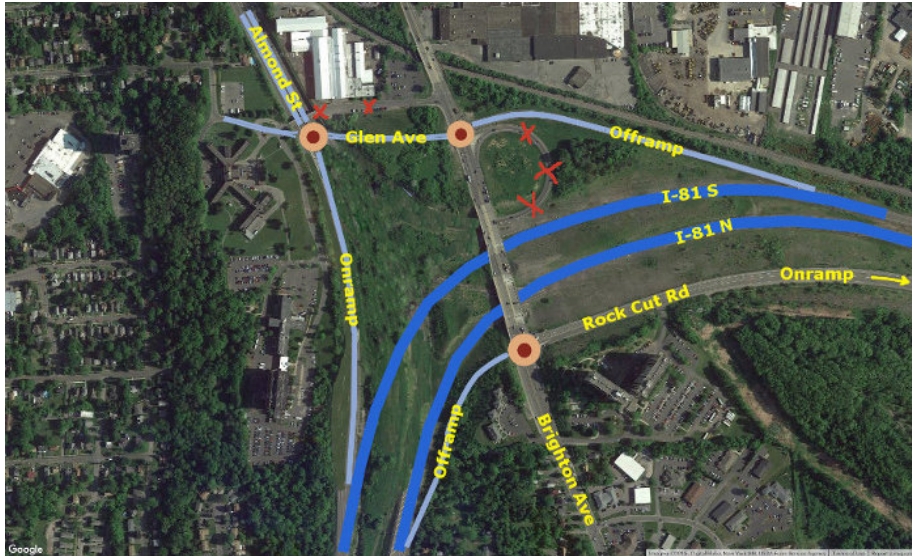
Alternative I-81 / Almond St junction that eliminates two bridges by rerouting I-81N off-ramp to Brighton Ave at Rock Cut Rd.
